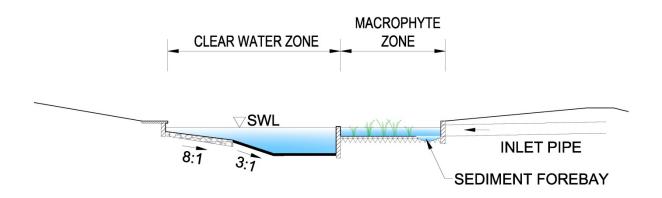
TYPICAL SECTION THROUGH A WET POND
